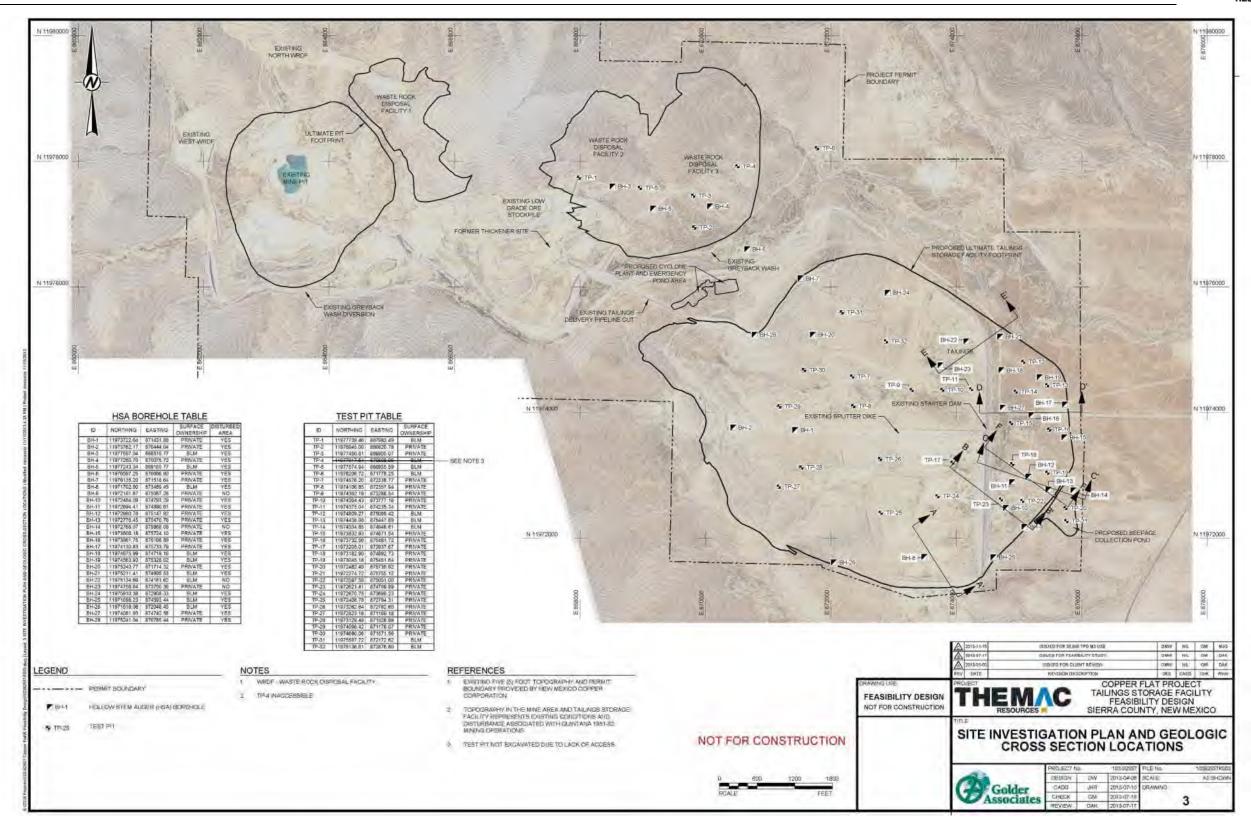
Site Exploration Plan and Geologic Cross Sections Locations
